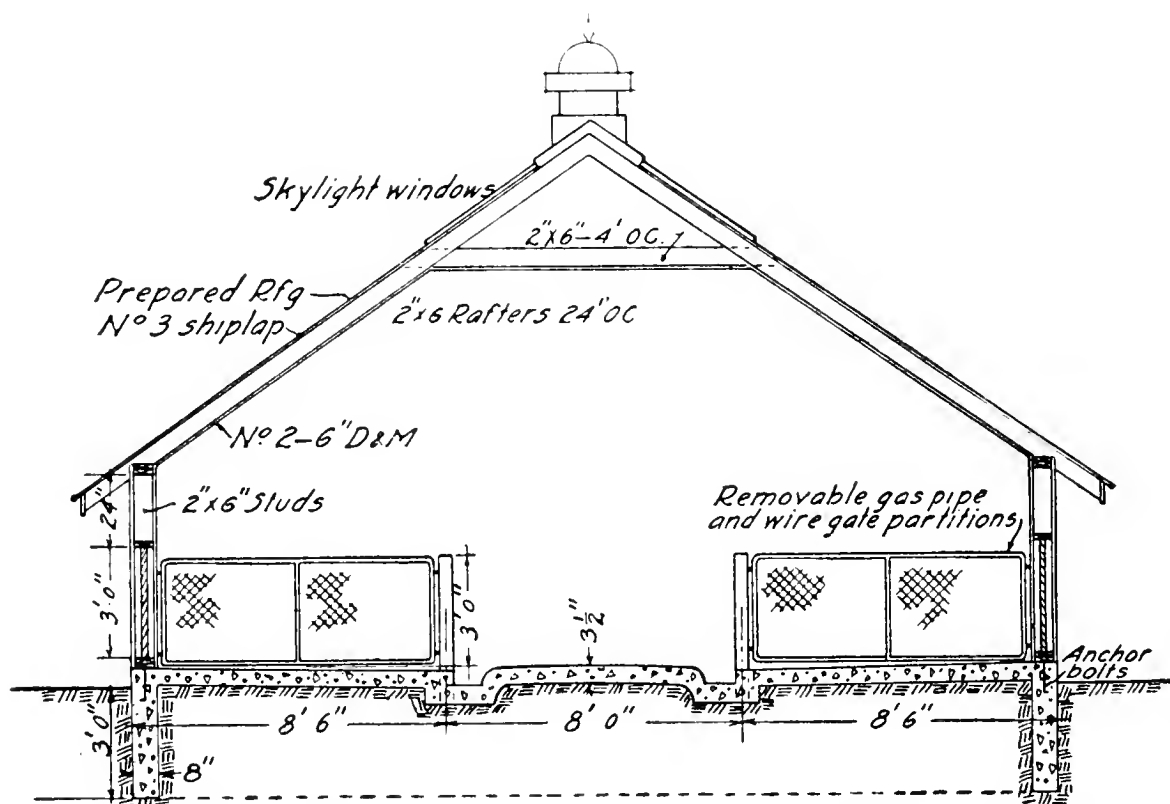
Cross section of hog house with skylights. This roof should run north and south.
